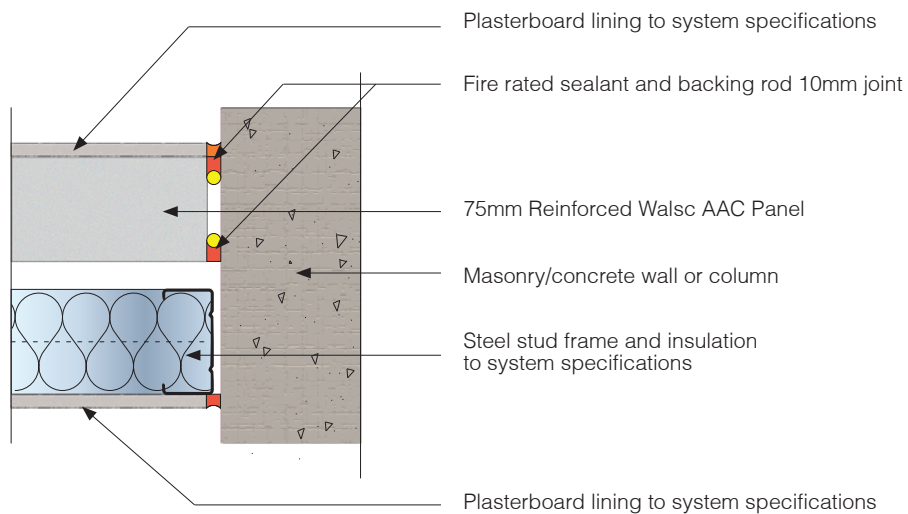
Internal Cavity Wall System Column Control Joint Detail
